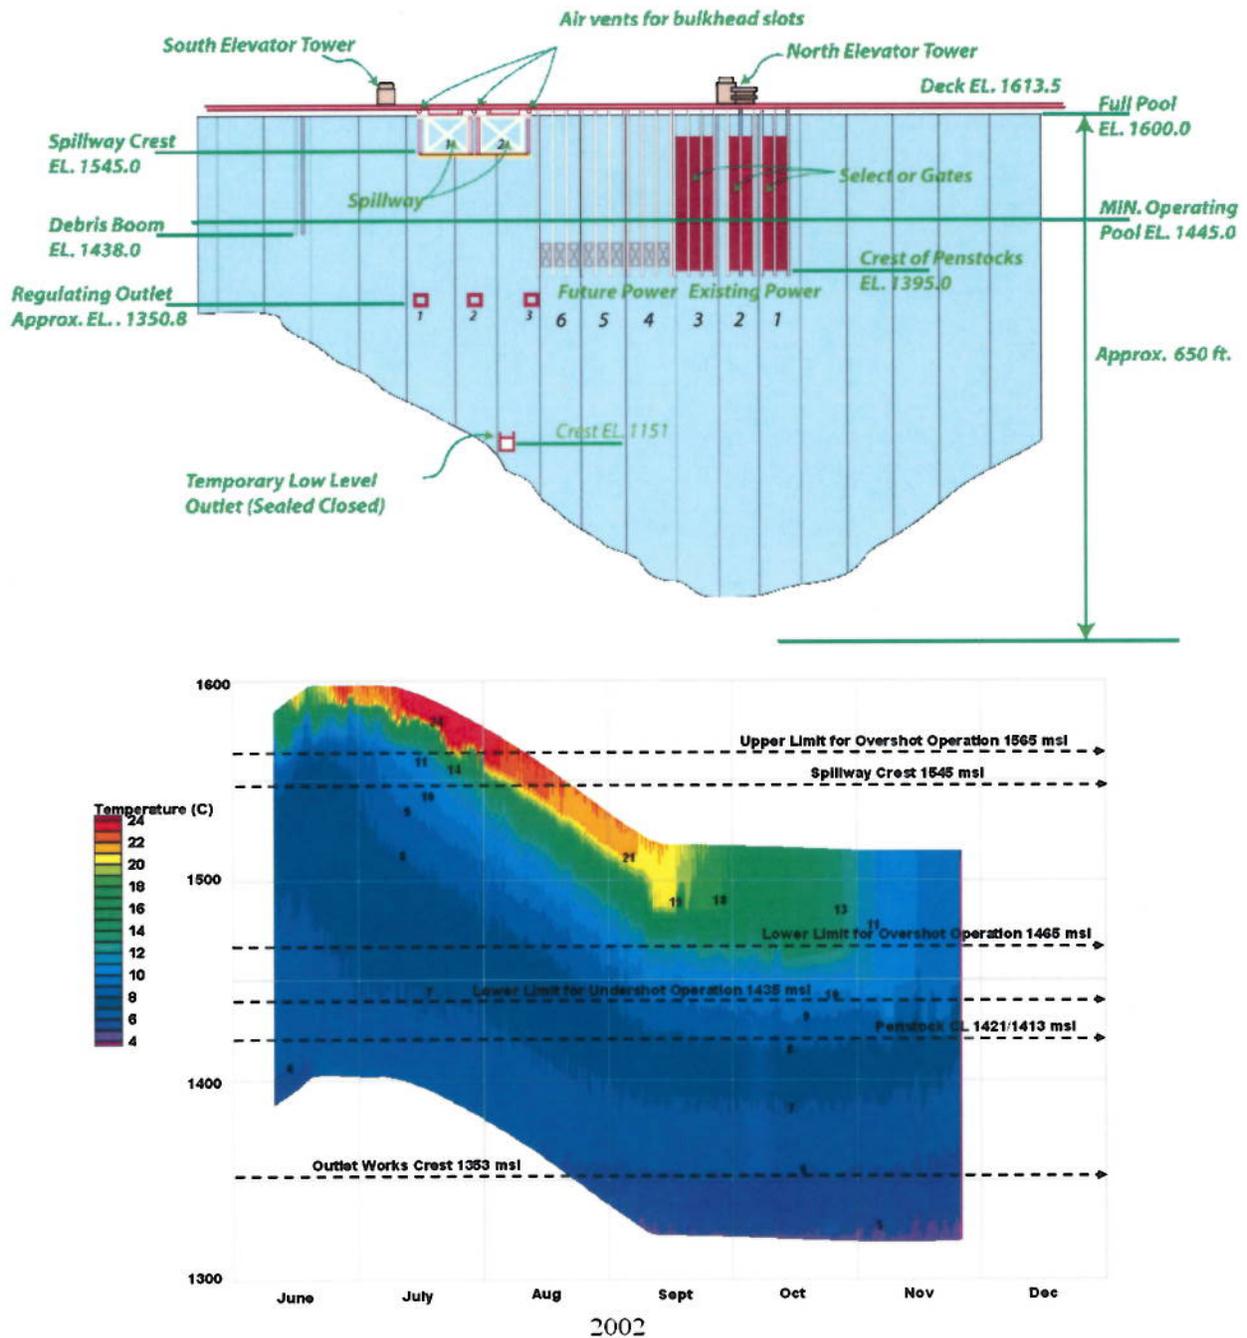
Dworshak Dam forebay cross-section illustrating typical thermal stratification.
